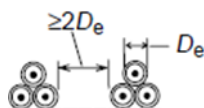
Single core power cables shall be installed in trefoil with minimum 2x cable outer diameter between trefoils as illustrated in IEC 60092 Part 352.
